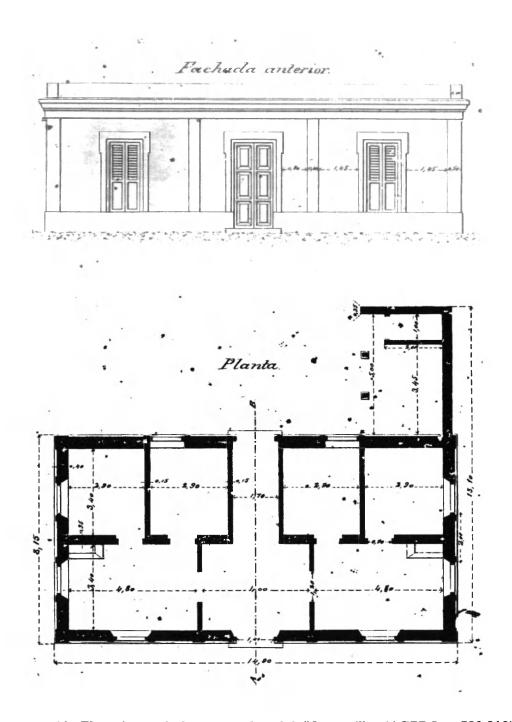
Elevation and plan view of model  $\#3a\ casilla$ . (AGPR Leg.580:210)
